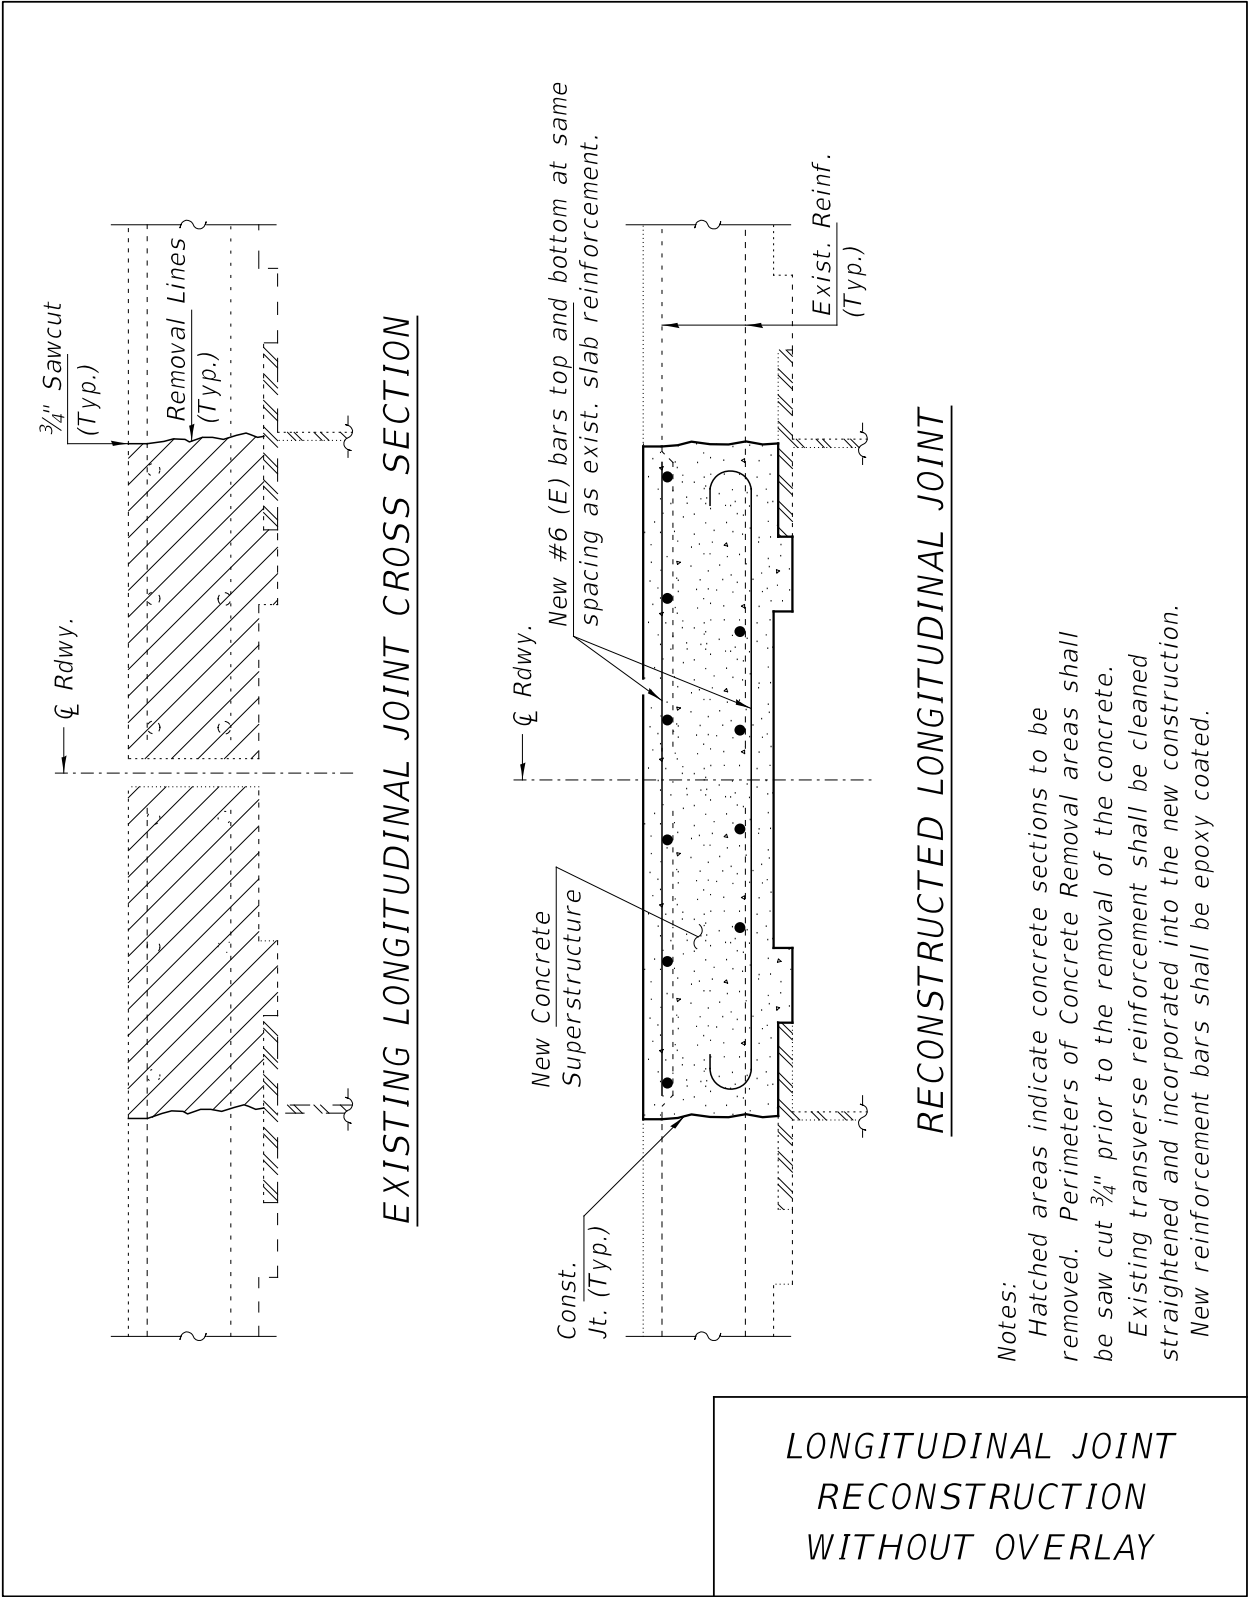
Longitudinal Joint Reconstruction Without Overlay
